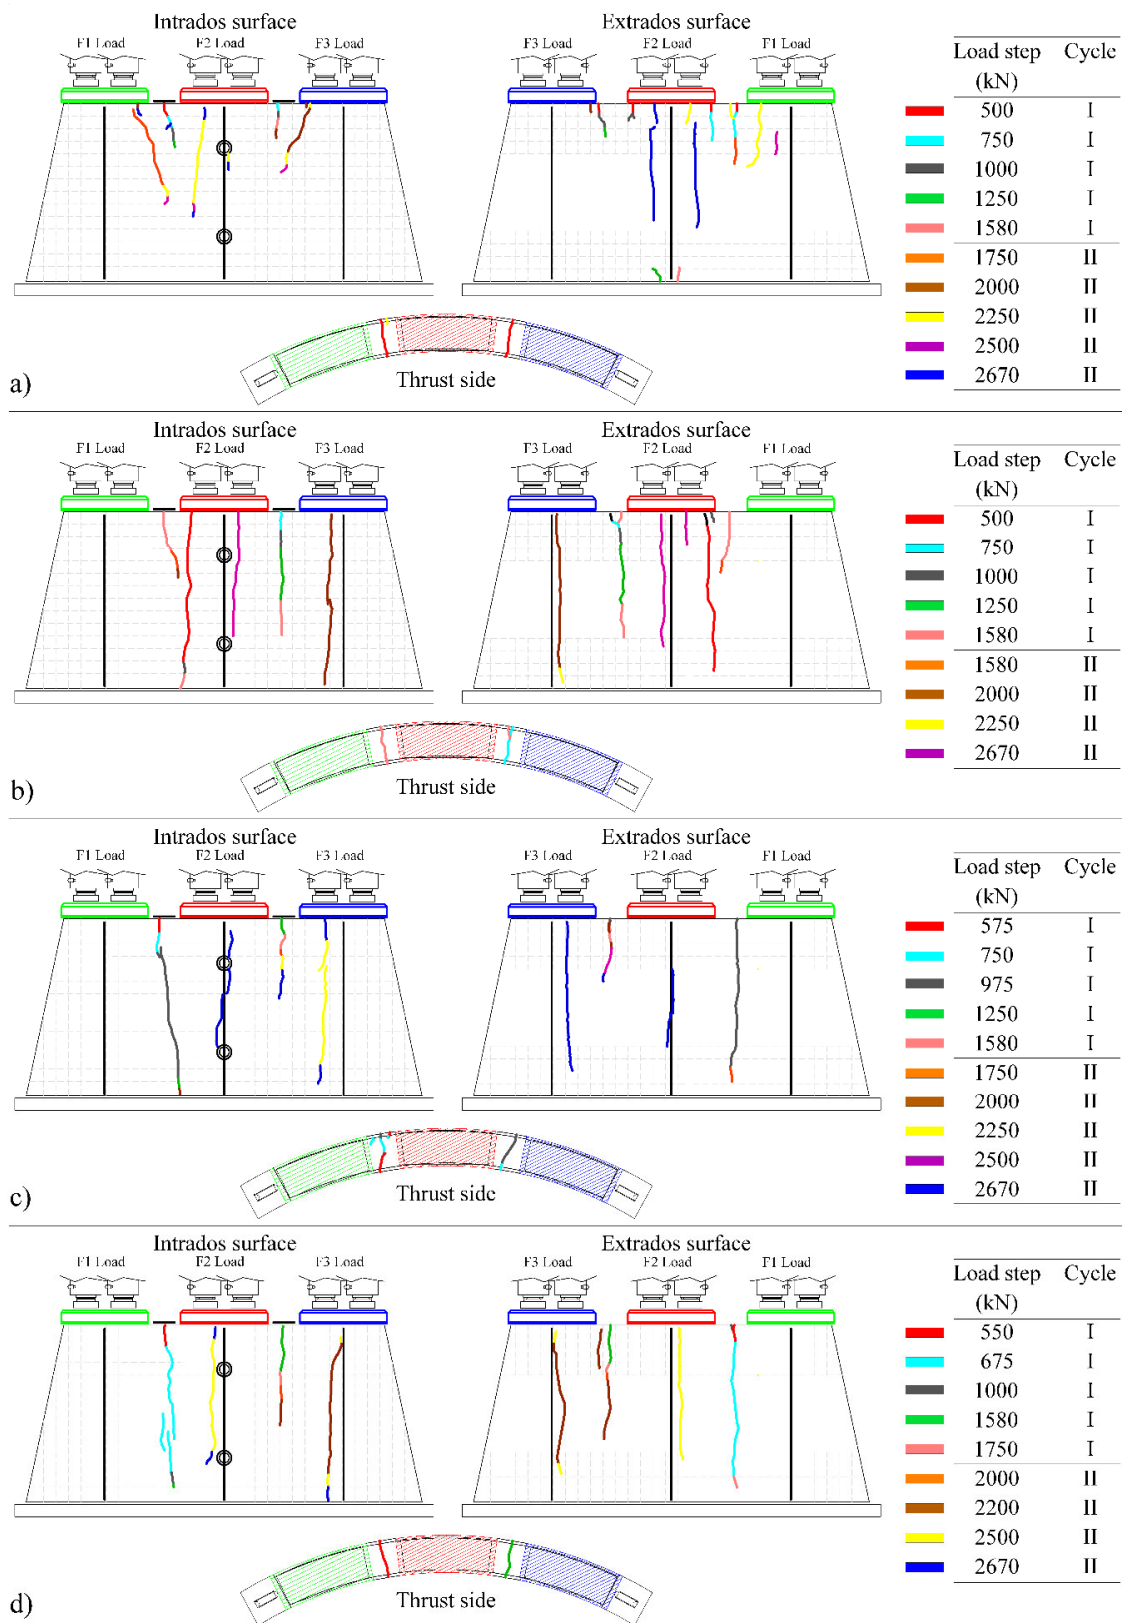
Point load test: crack pattern. a) SR; b) GFRP-RR; c) GFRP-LR; d) GFRP-WR.
